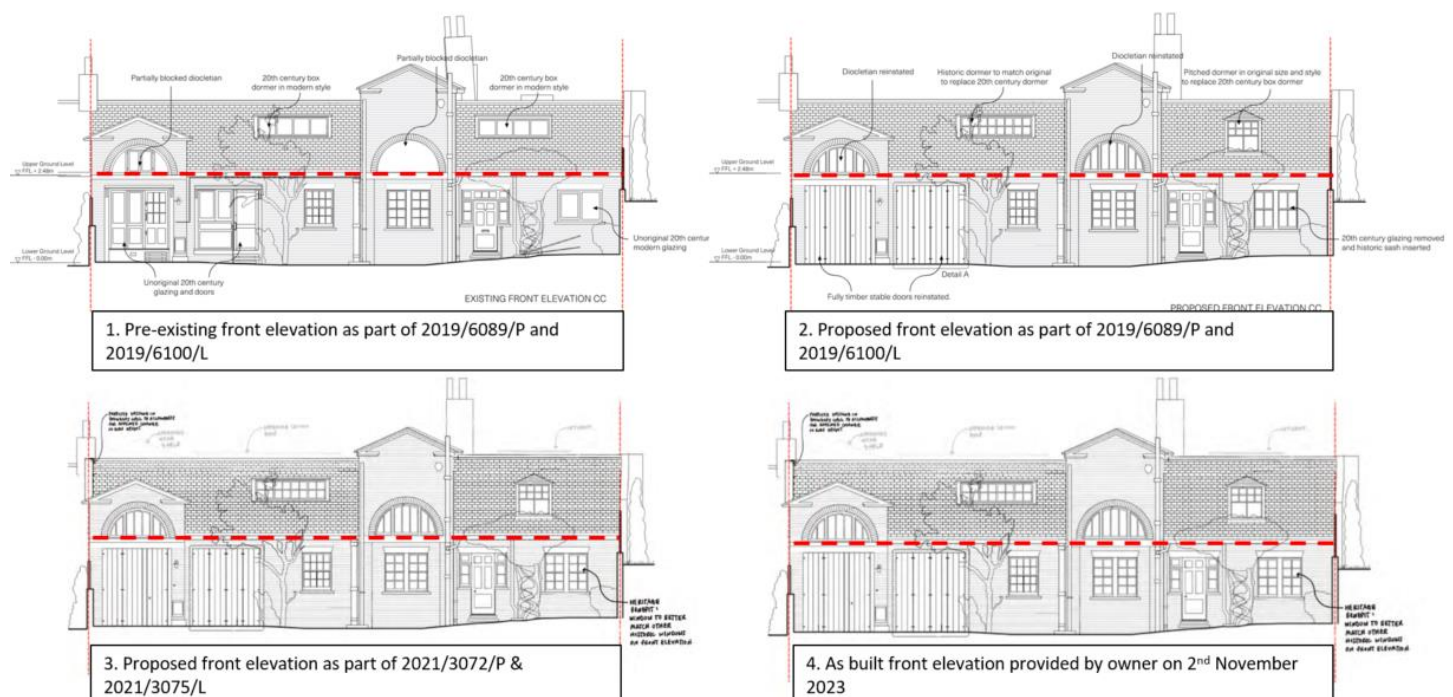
1. Pre-existing front elevation, 2. Proposed front elevation 2019/6089/P and 2019/6100/L, 3. Proposed front elevation as part of 2021/3072/P & 2021/3075/L, 4. As built front elevation provided by owner on 10th October 2023
